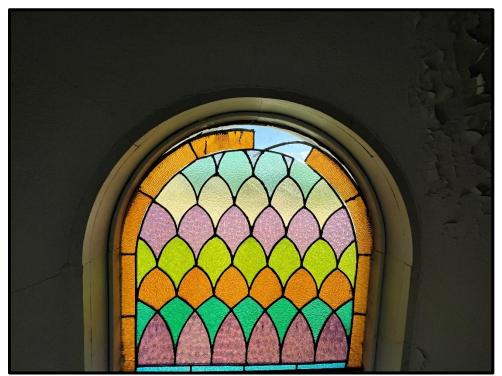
7119 Tecumseh Road Interior – Broken and Missing Components on Stained Glass Windows (Photo taken July 22, 2022)
